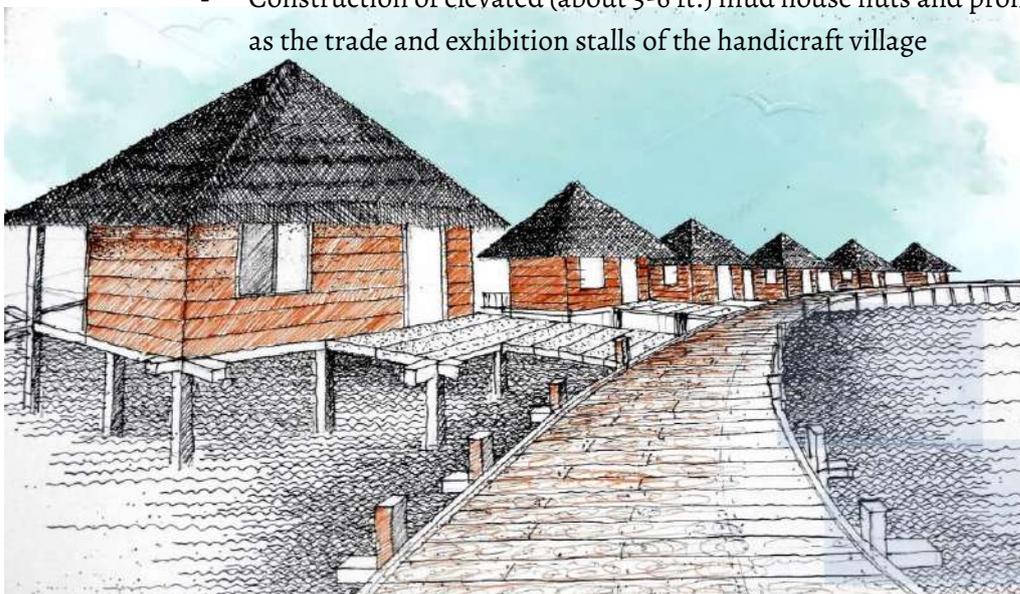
A conceptual image of recommended elevated mud house designs for the proposed Handicraft Village
